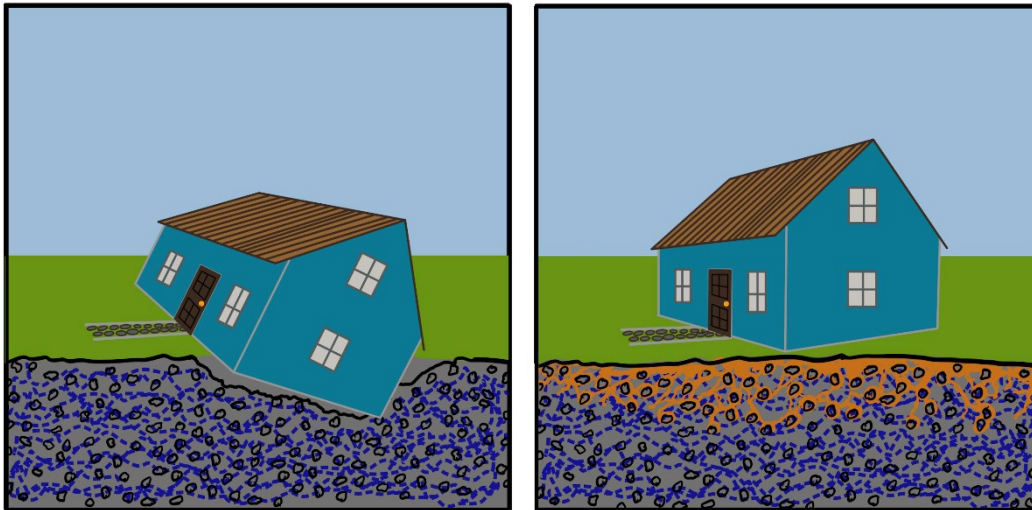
Left, untreated loose soil can cause foundations to fail and structures to be damaged. Right, soil stabilized using engineered biomineralization.
